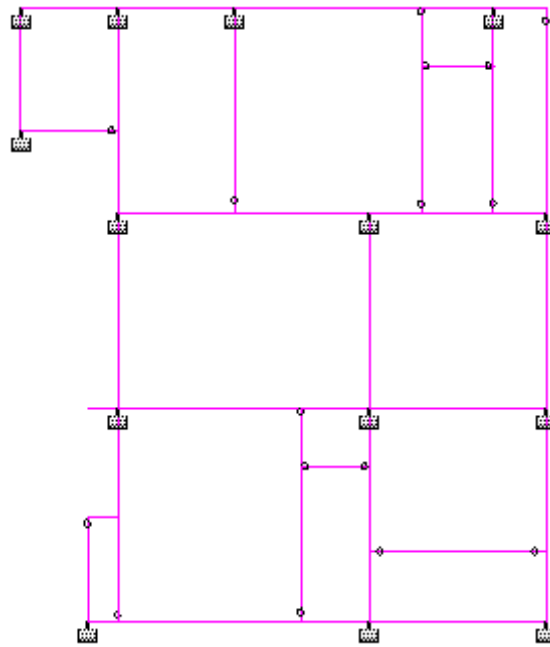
STAAD Model of Residential Building(without diaphragm) in plan view
